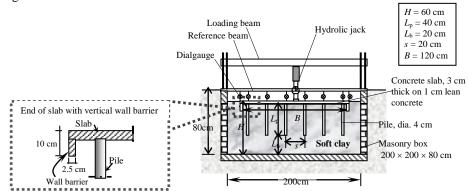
Schematic cross section set-up of loading test on Nailed-slab System model.
